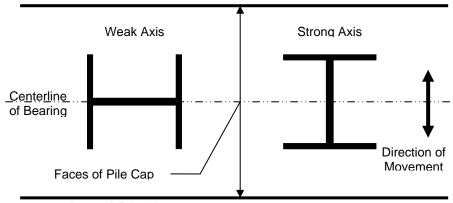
Typical orientation of piles in pile cap.
